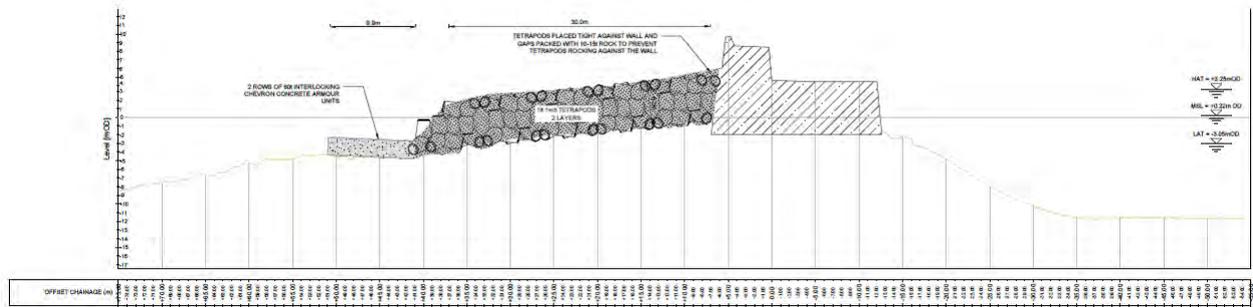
Typical cross section through proposed Tetrapod solution for the seaward side.
